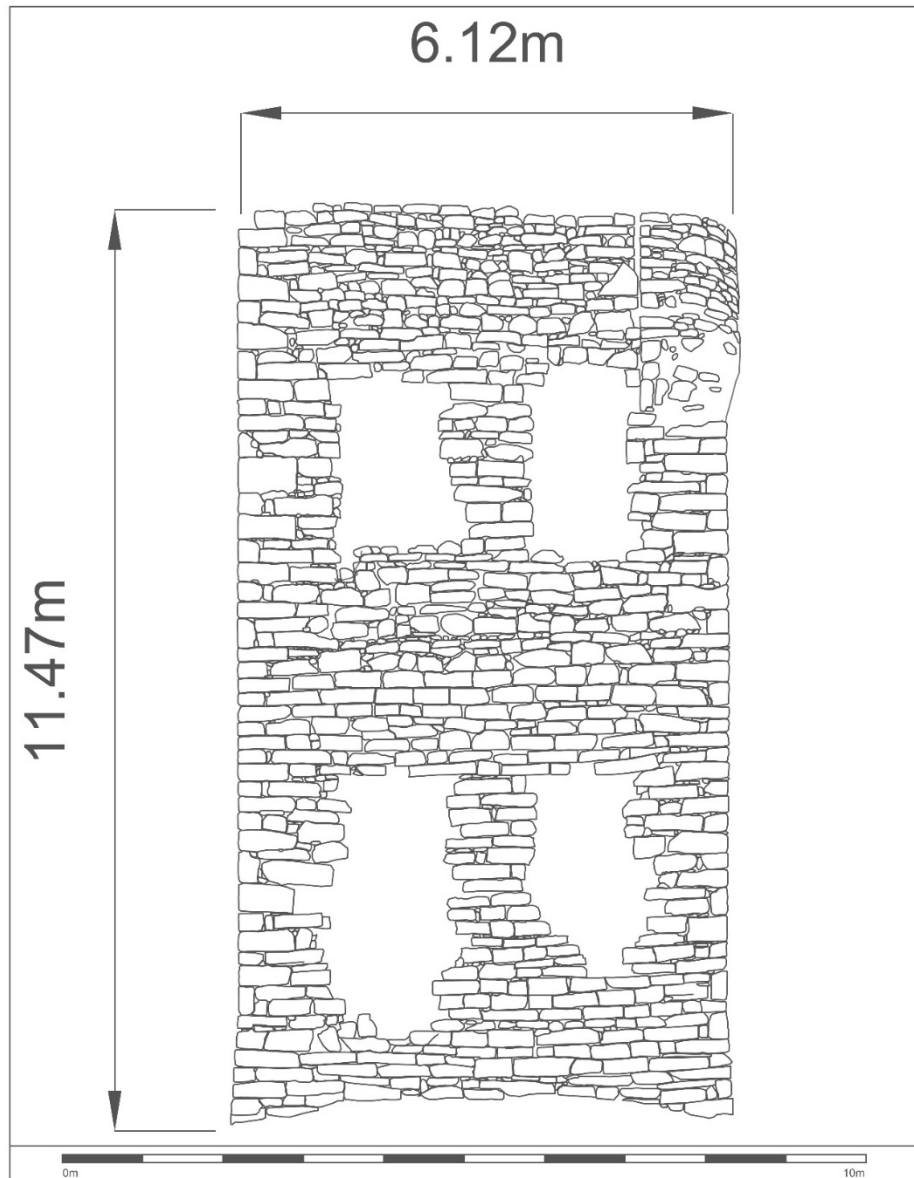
External elevation of south wall of the signal tower at Glash Signal Station.
